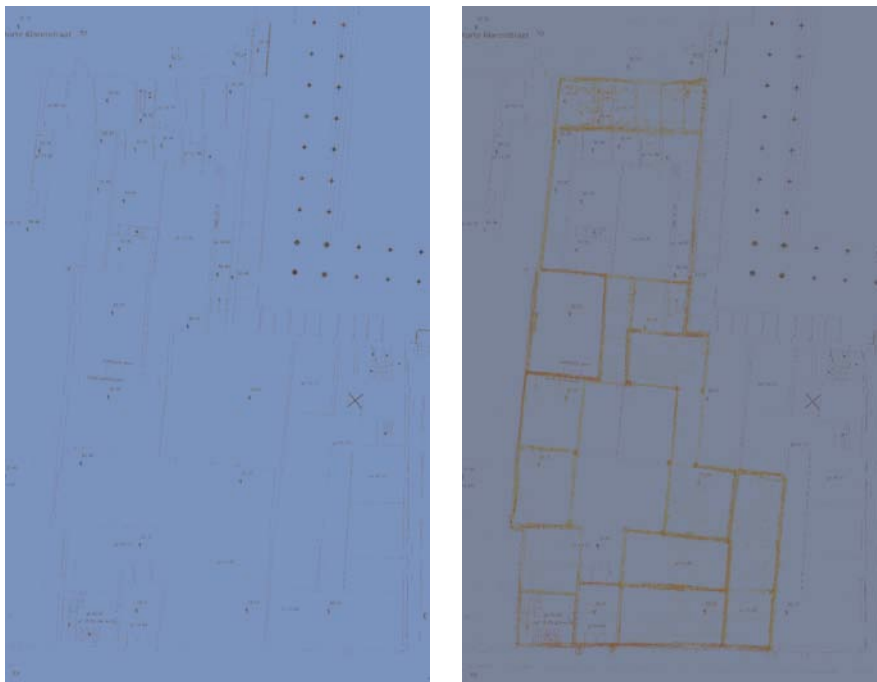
'Hotel du Bois'. The left ground plan shows the present state. The right ground plan shows the reconstruction of the space concept. The rooms and walls in red are still original. The orange spaces and walls are the reconstruction: the inner court en garden will be recreated.
